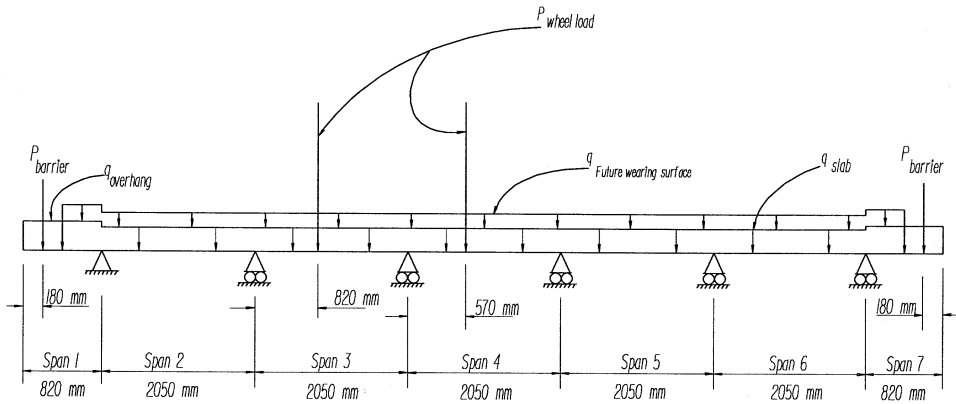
Loads:  $M_{+ve}$  Alternative 1 (one lane).
